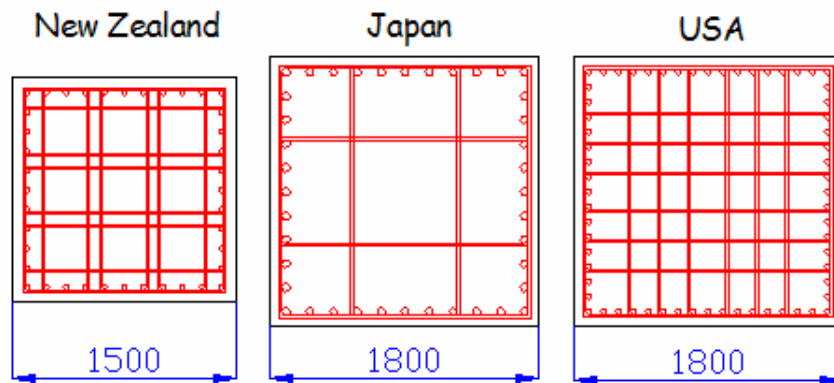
Cross Section Dimensions of the Bridge Piers
